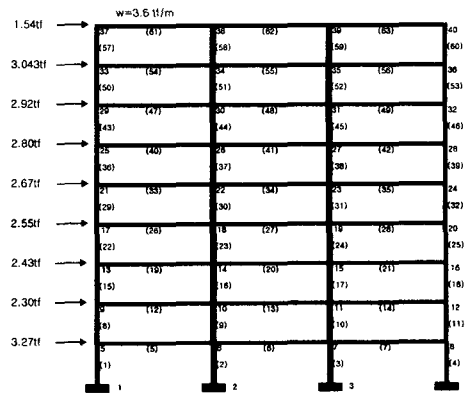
3-bay, 9-story reinforced concrete frame subject to gravity and lateral load. (span=9m, story height=3.6m)
